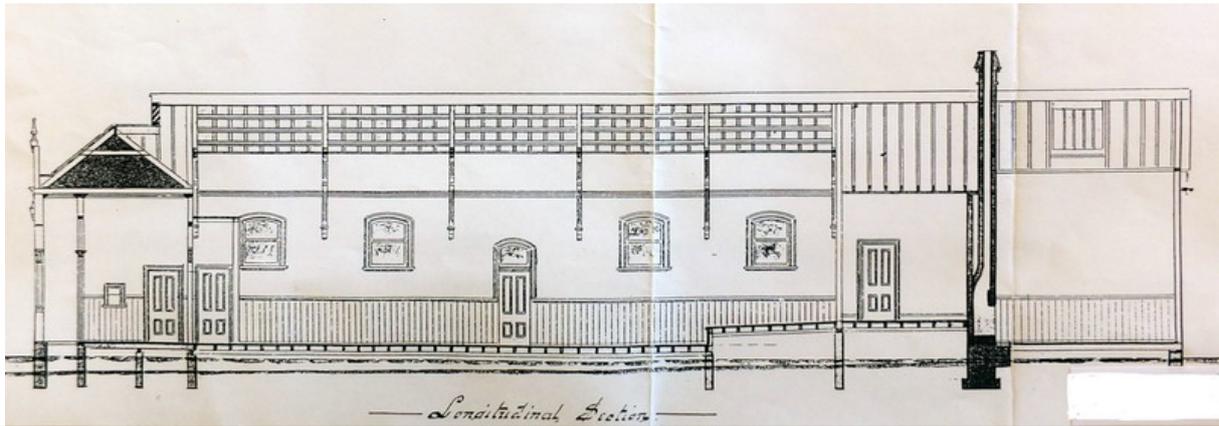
A. Davidson, Longitudinal section drawing of proposed Ballan Mechanics' Institute, 1886.
